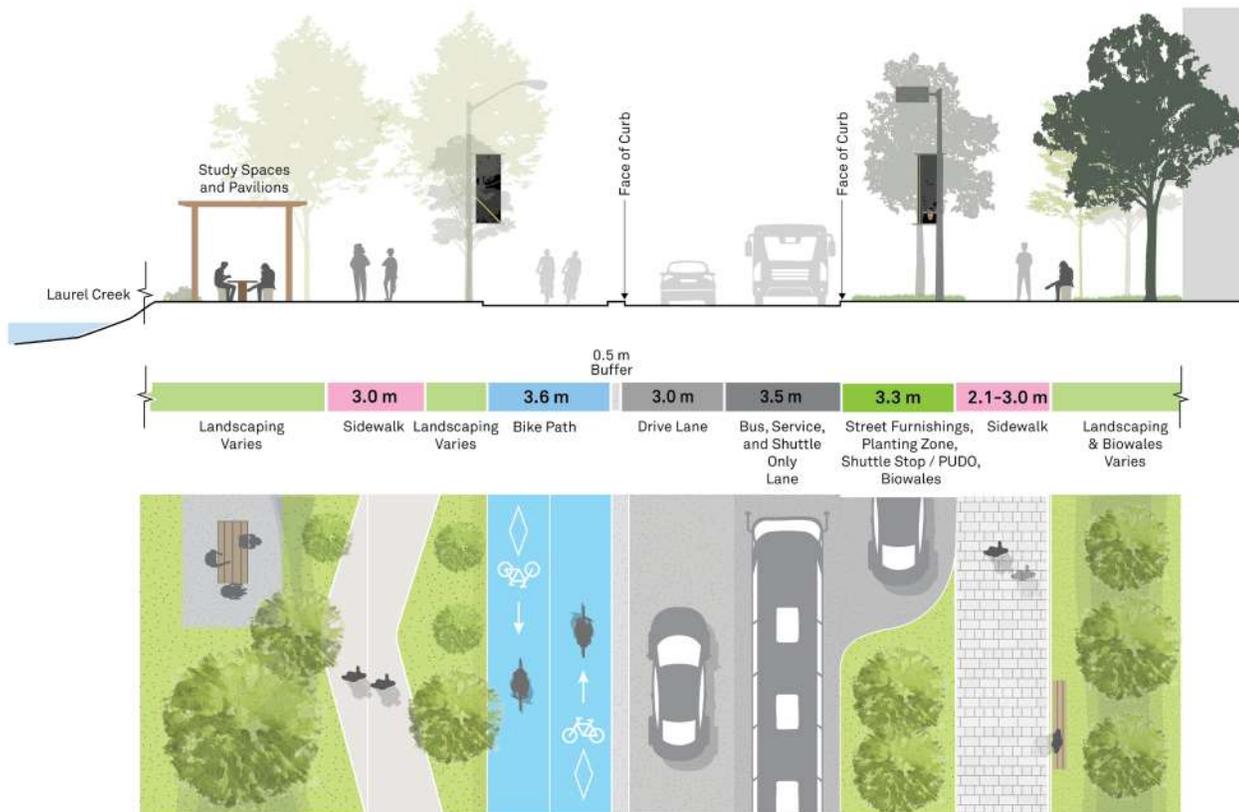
Section A. Proposed condition of Ring Road (western edge).
